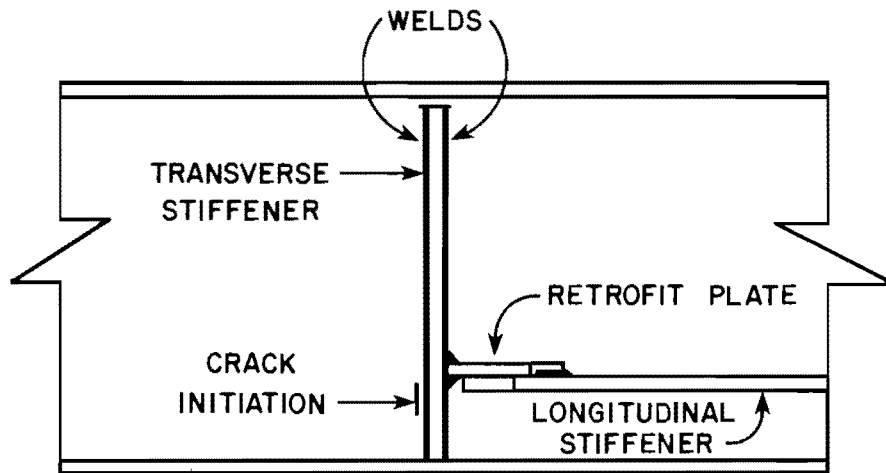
Crack initiation in one-sided retrofit specimen
